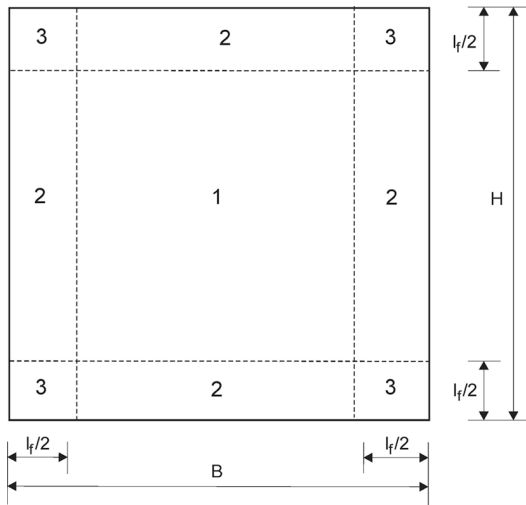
Composite space cross-section divided into sections (2): l_f – fibre length; H – element height; B – element breadth
